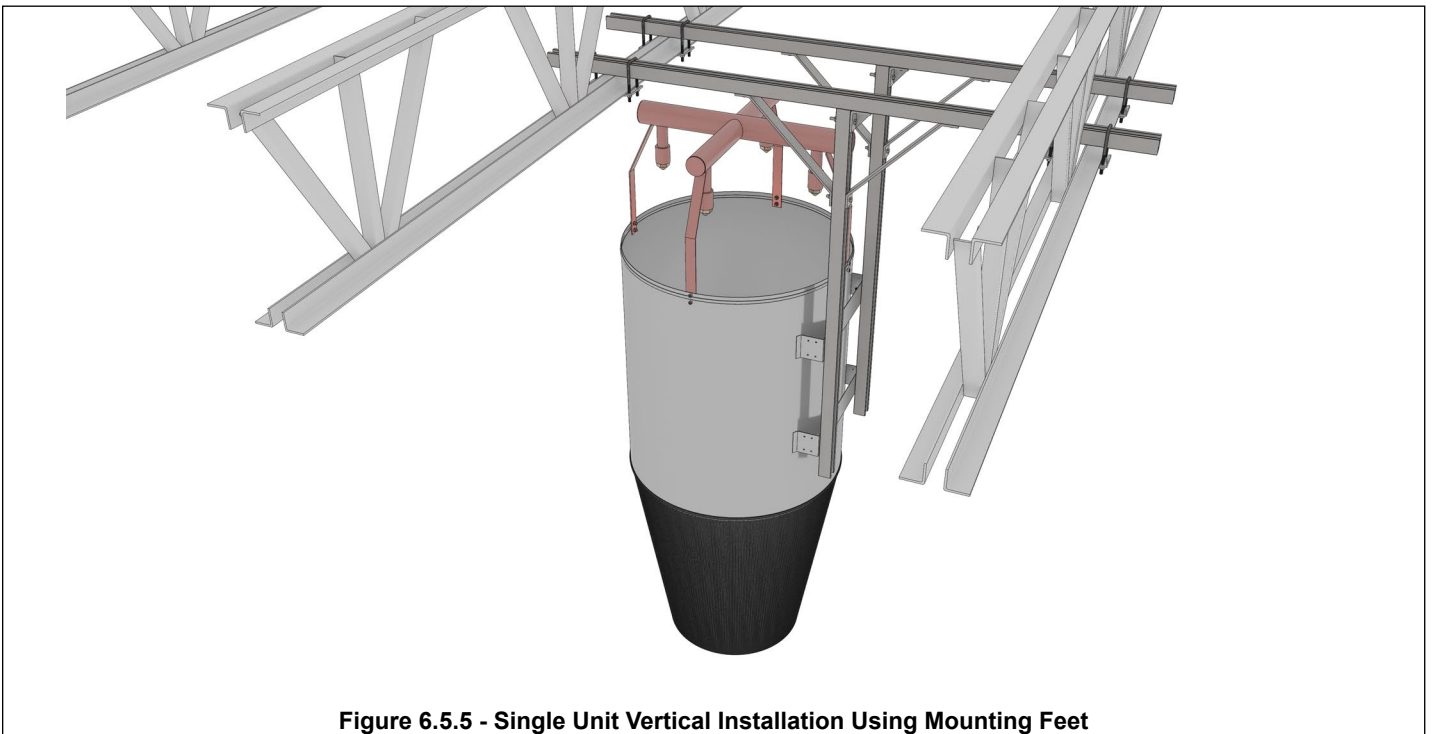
Single Unit Vertical Installation Using Mounting Feet
